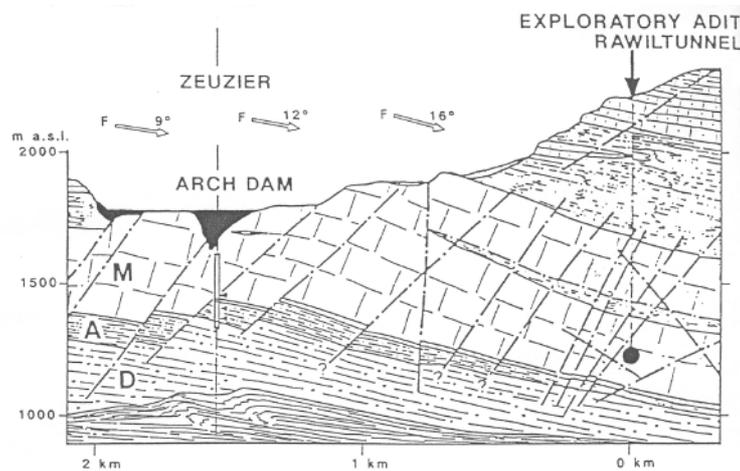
The excavation of the exploratory adit drained the ground water entrapped in layer D, caused the settlement of the region and damaged heavily the Zeuzier arch dam.
